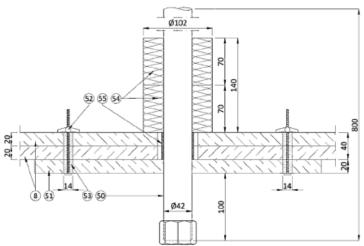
Schematic drawing of fitting "G" $\,$
